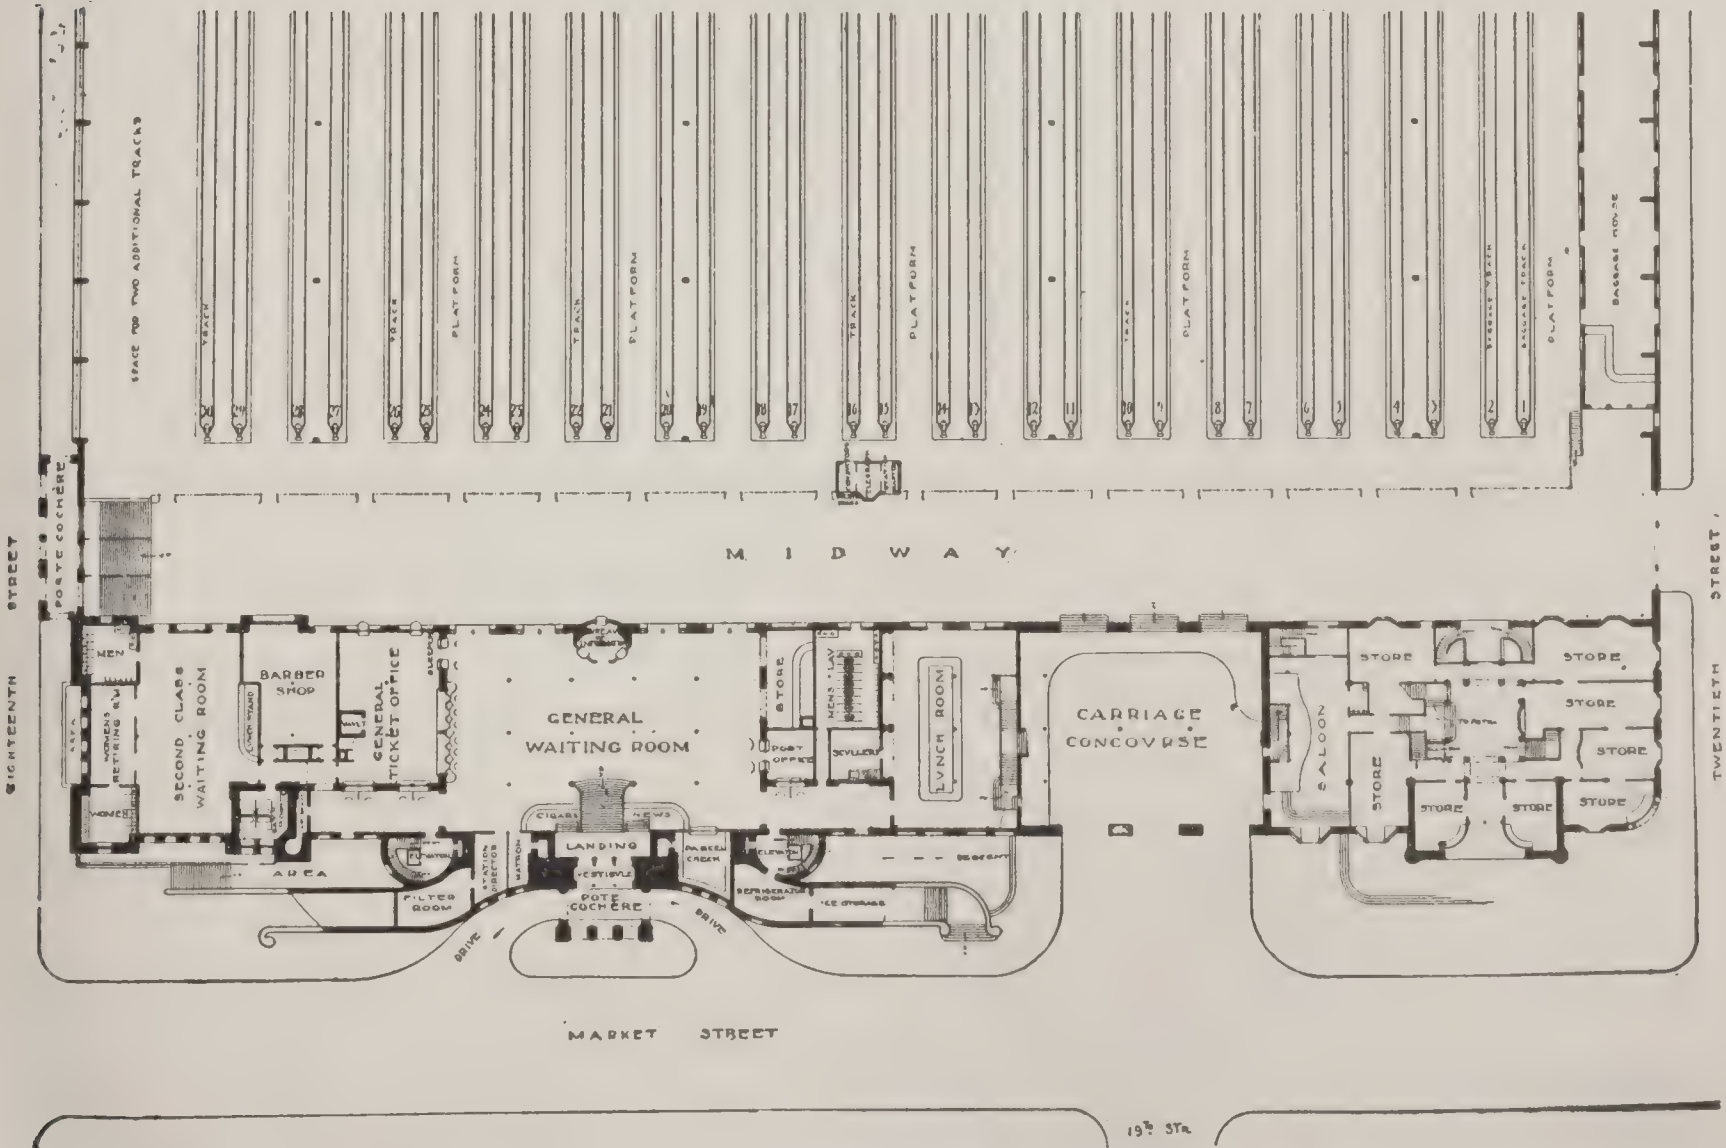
PLATE II.—Ground Floor: Midway and Tracks, Saint Louis.
